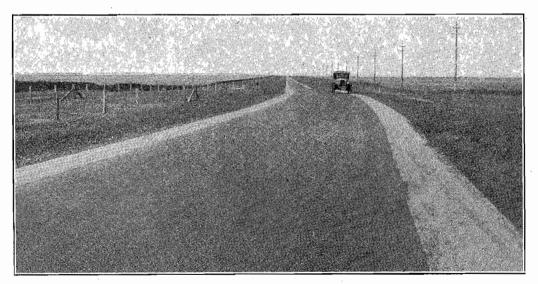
Prince's Highway West. Completed pavement with Concrete widening slabs and existing pavement reinforced with Bituminous Concrete.
